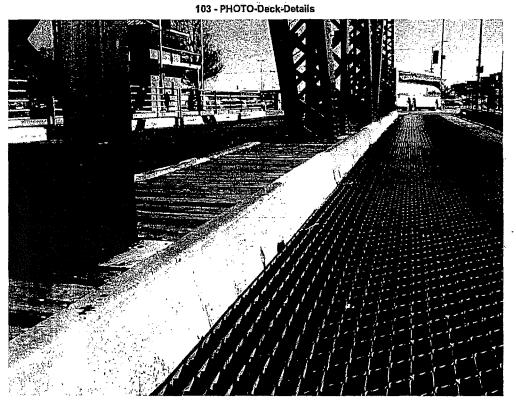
Rrepaired spalled curb areas, typical
